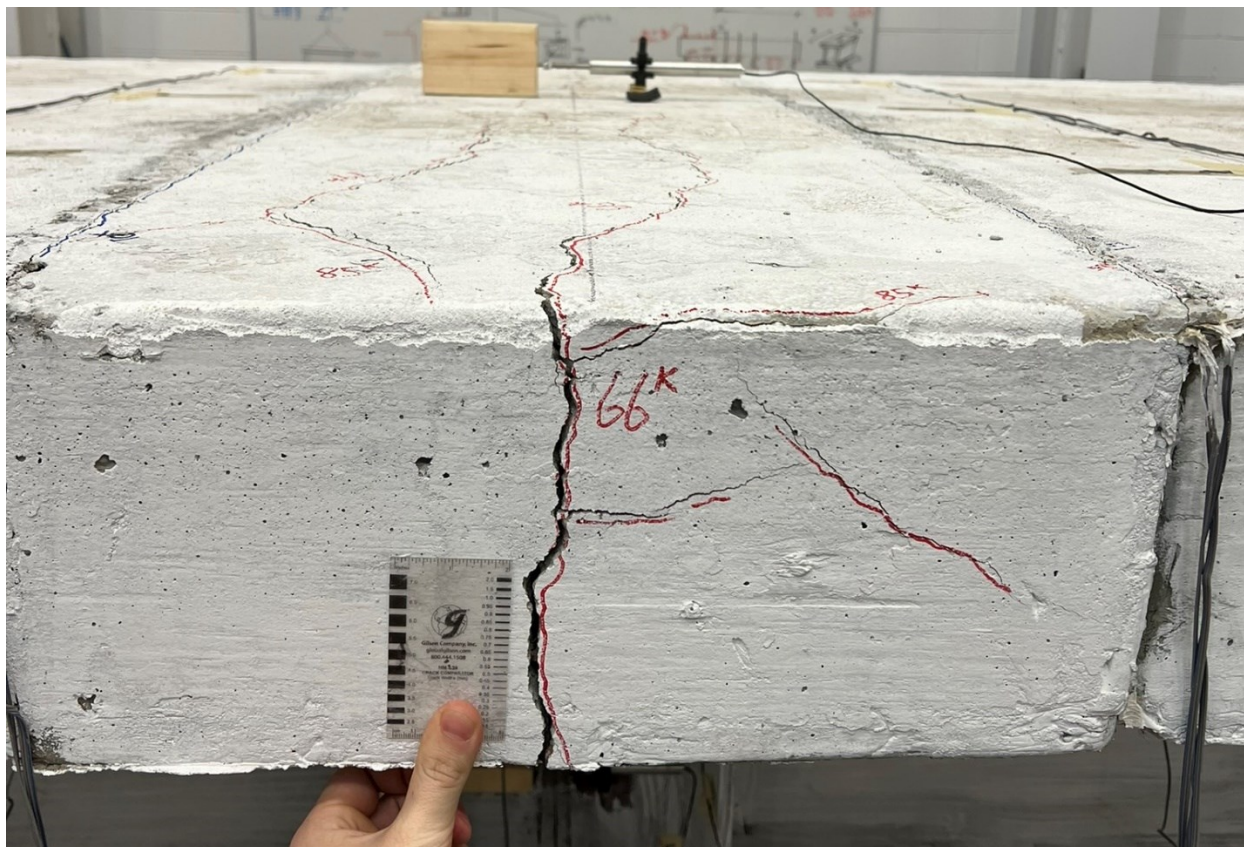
View of Cracking on North Side of Deck in Closure Pour.
